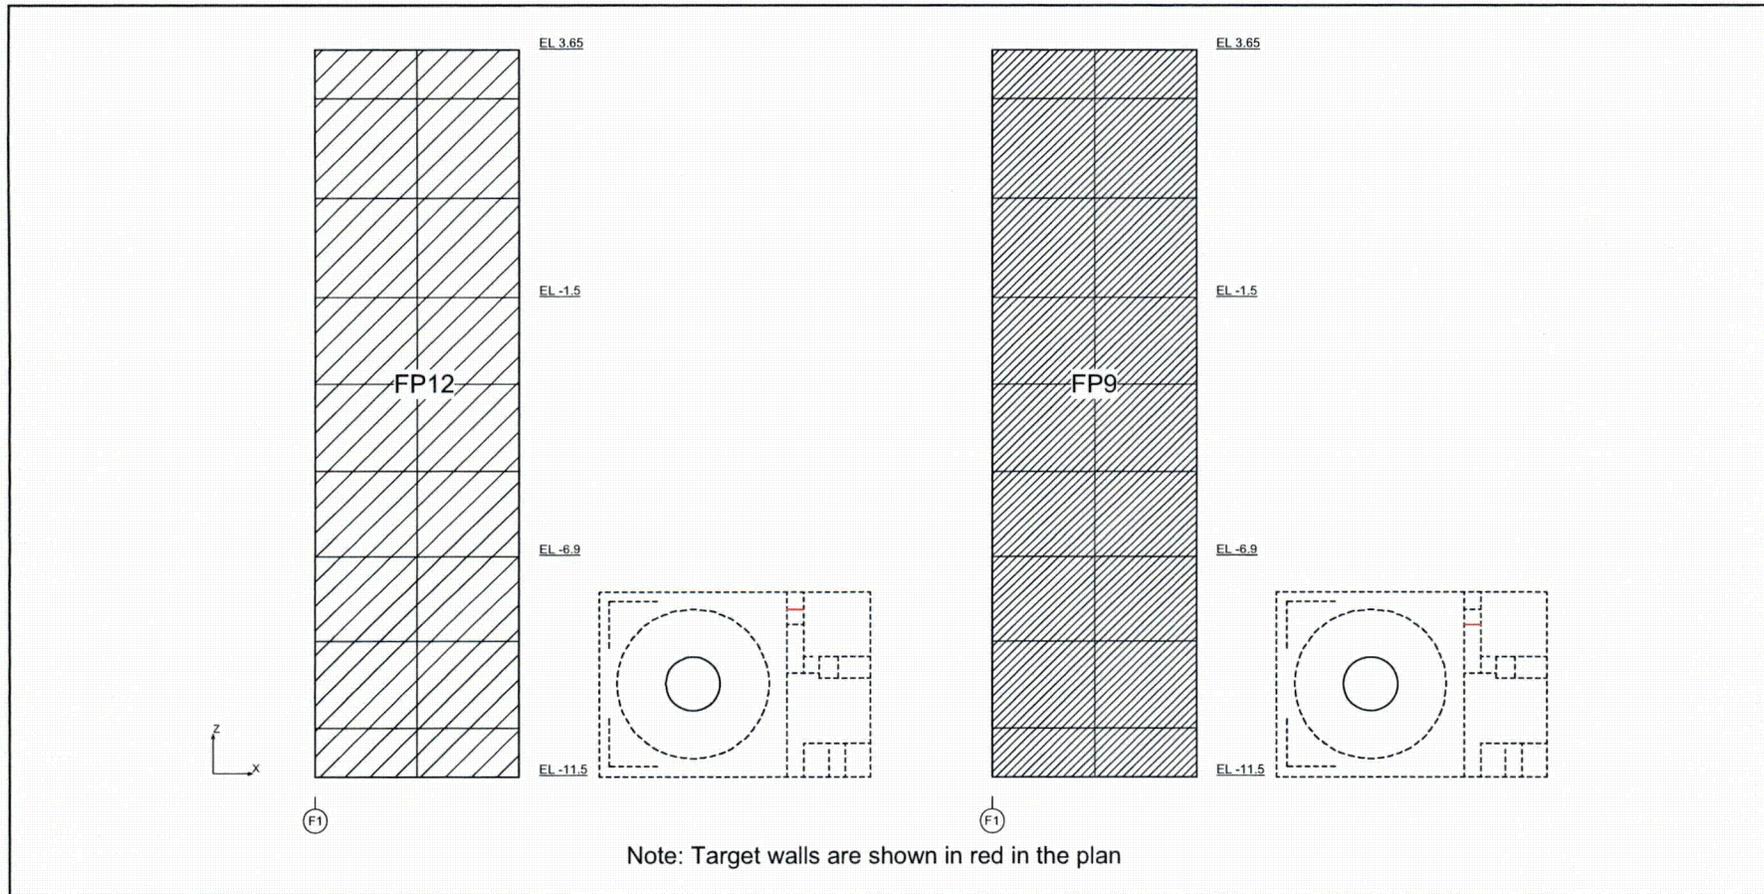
Application of Thermal Load on the Spent Fuel Pool Wall-2
